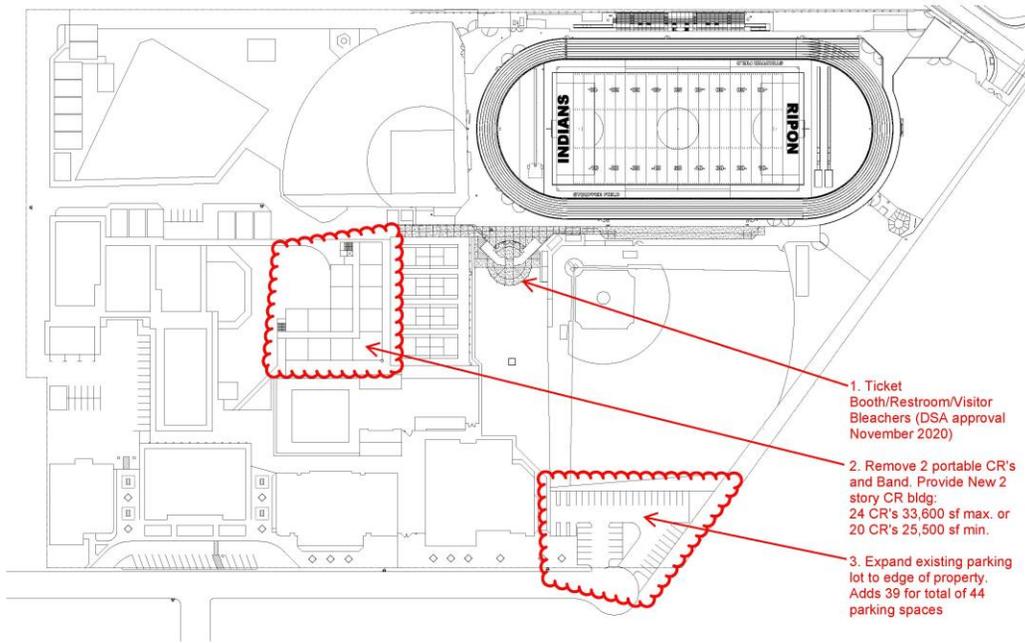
and 17 provide potential locations for new facilities proposed at Ripon Elementary and Ripon High School. Figure 16 shows the possible locations of new kindergarten classrooms and play areas, the new MUB building and outdoor lunch area, parking lots, and three potential locations for new bus drop off areas at Ripon Elementary School. Figure 17 shows the location of potential improvements at Ripon High School, including identifying the potential location for a new classroom building and expanded parking lot.
